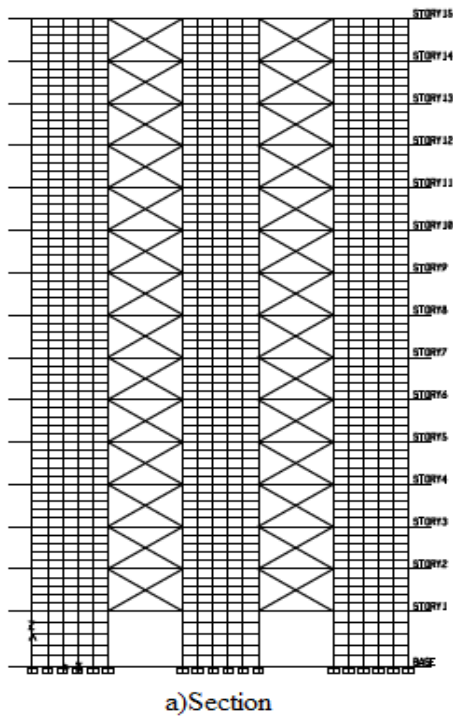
Model-11 OGS Frame with Shear wall at Corner and Core
